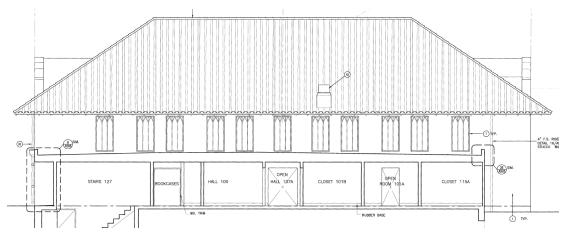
East elevation drawing, illustrating current design of east façade, with clerestory windows. Source: Stanford University, 2007.
